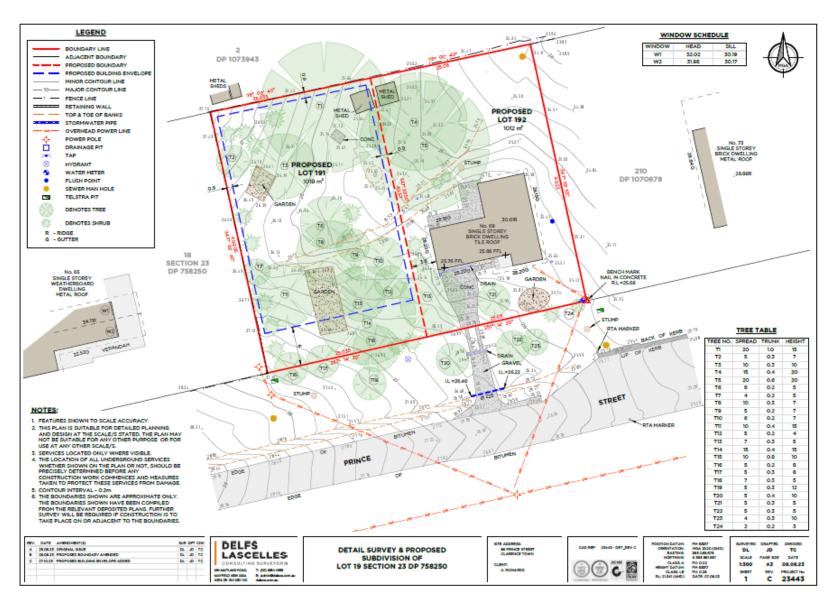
Proposed Subdivision Plan (Delfs Lascelles, 2023)
